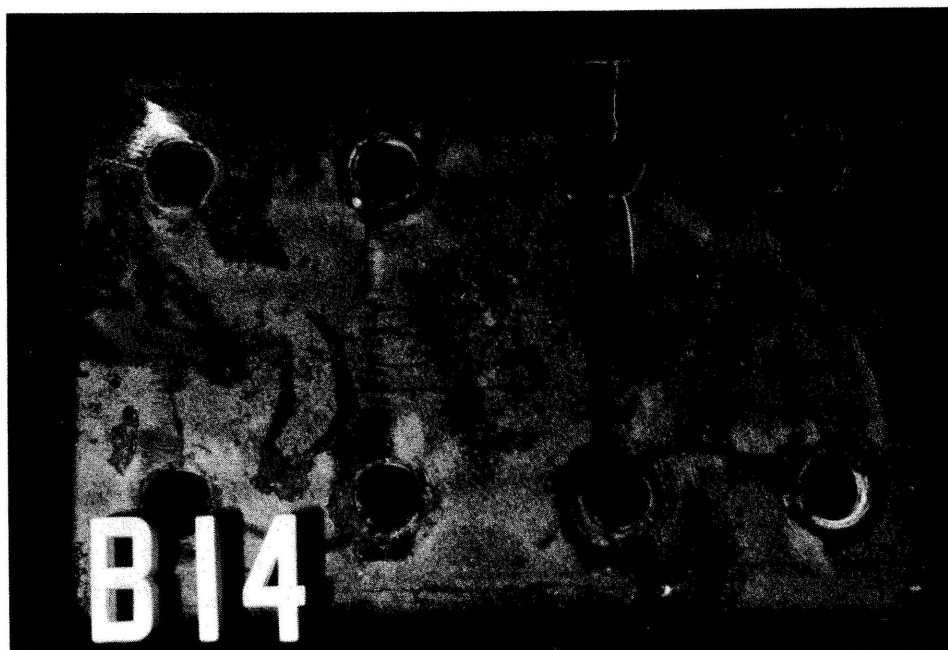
Fatigue crack in splice plate at second bolt row (Splice B14-2)
